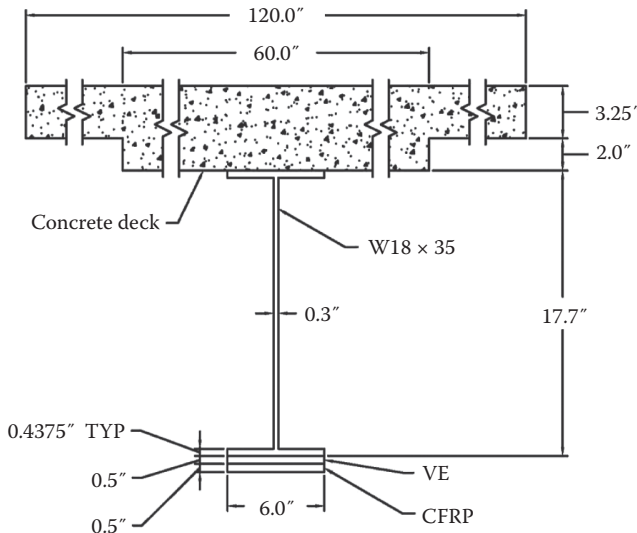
Dimensions of beam and slab as modeled (1 in. = 25.4 mm).
